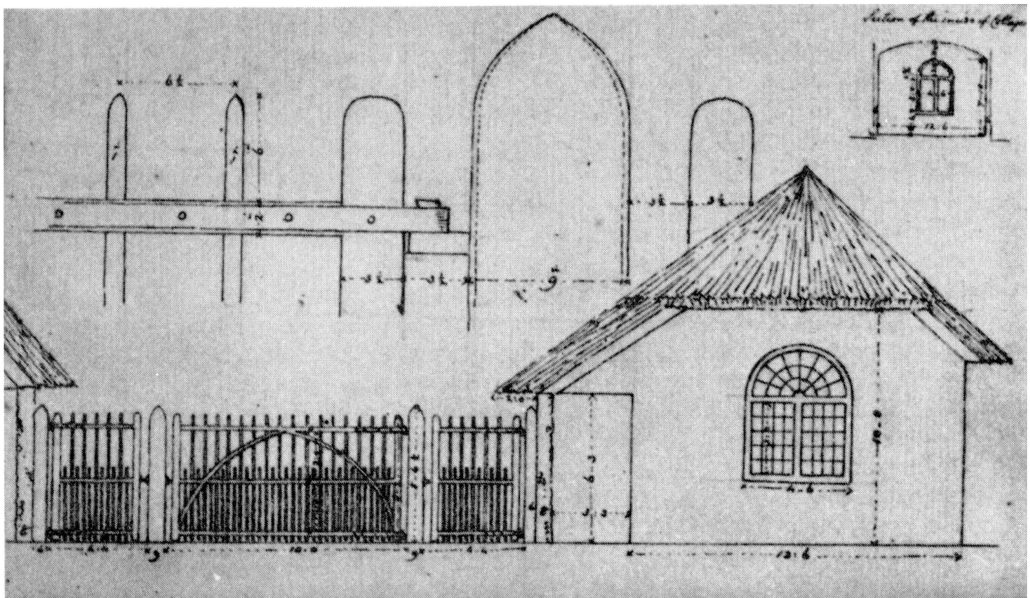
Elevation for a gated cottage – one of a pair – with details of gates and interior. George Repton. Museums, Art Gallery and Royal Pavilion, Brighton.
